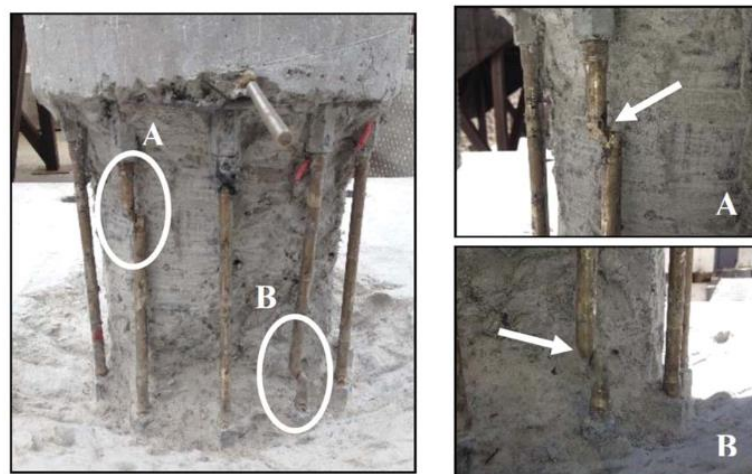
Location of SMA Bar Fracture in Threaded Coupler Column [25]
